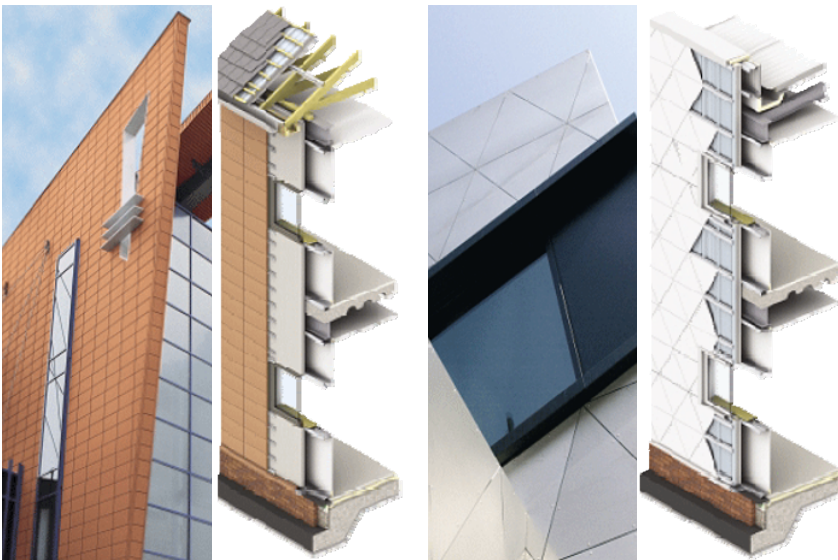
Solutions for wall façade (Kingspan, 2007)
